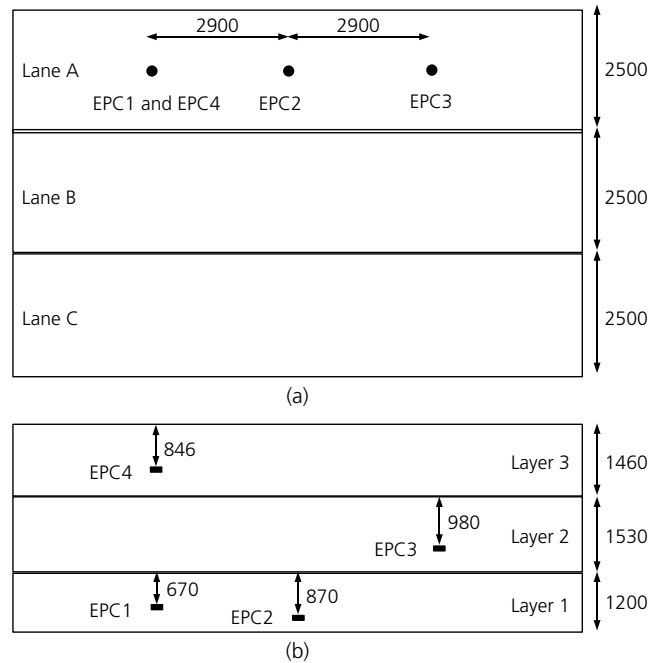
(a) Plan and (b) elevation views of test pad including EPC locations (all dimensions in mm)
